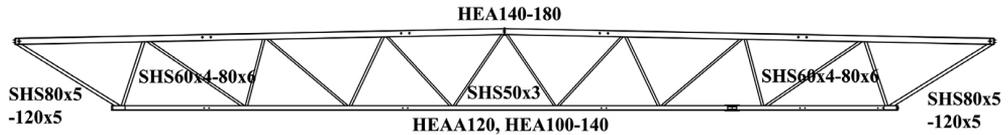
Profiles used for truss purlin with a span of 24 meters
